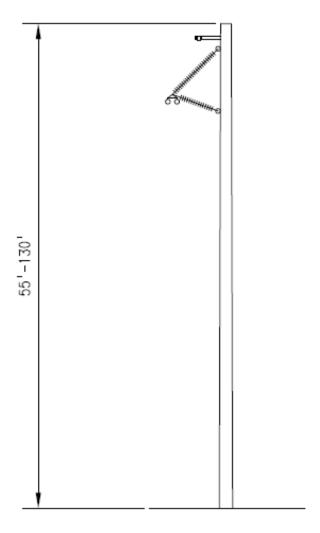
A Proposed Temporary Steel Pole Structures (Shoo-fly)
